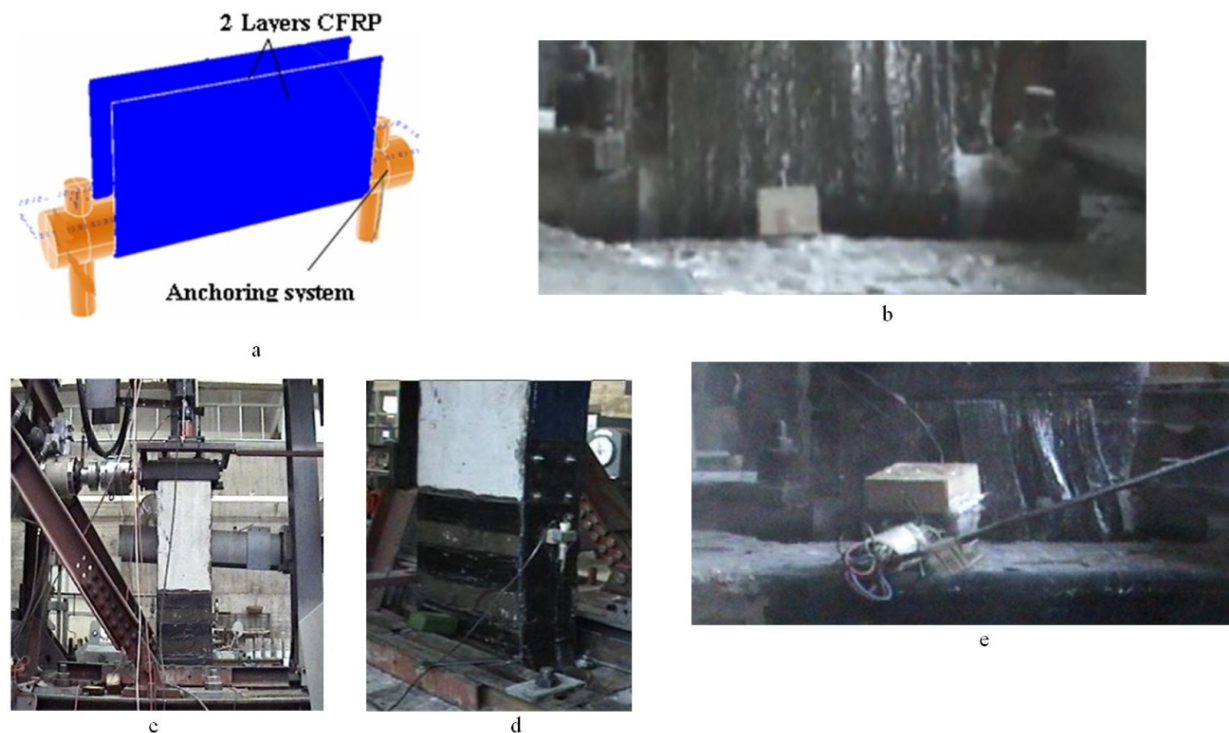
a. New anchoring device. b. New anchoring device. c. Specimen Rep-3 Pier A. Figure d. Specimen Rep-3 Pier A. Figure e. Partial fracture of CFRP layers at the cylindrical part of anchoring device
